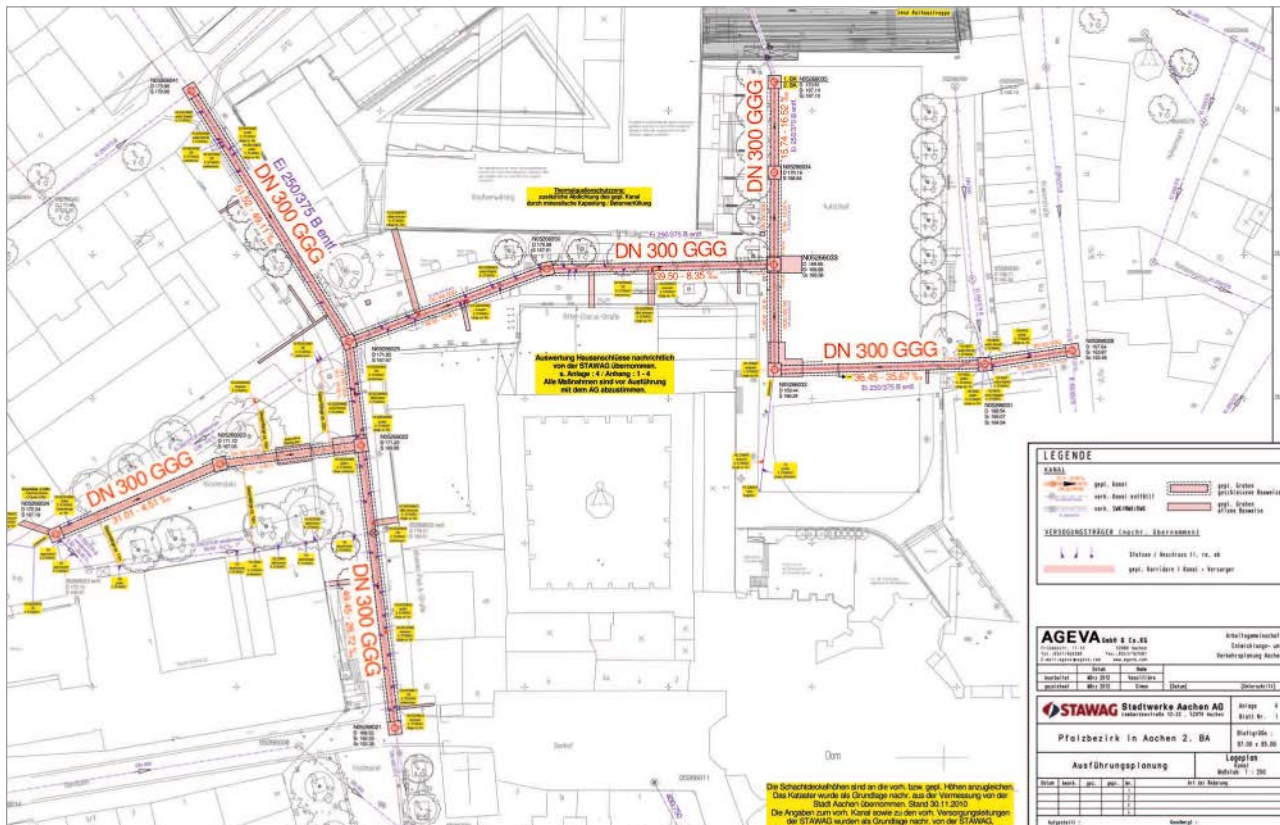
Construction plan – practically the entire route was laid using the trenchless technique
